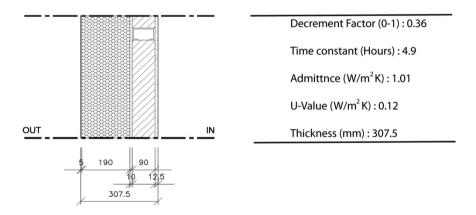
From out to in: 5mm Rendering, 190mm Extruded Polystyrene (EPS), 10mm Plywood, 90mm Rockwool, 12.5mm Plasterboard
